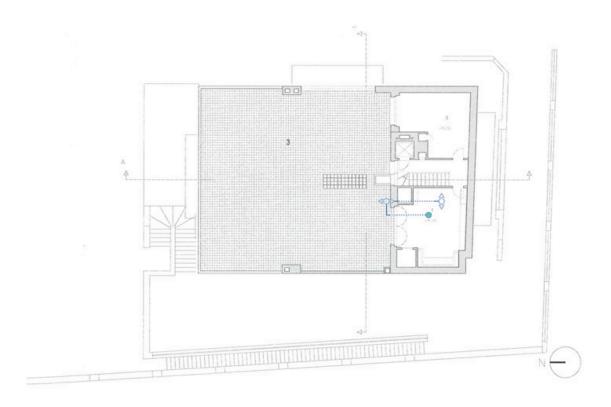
Third Floor Plans of Muller House by Adolf Loos. Source: http://www.mullerovavila.cz
